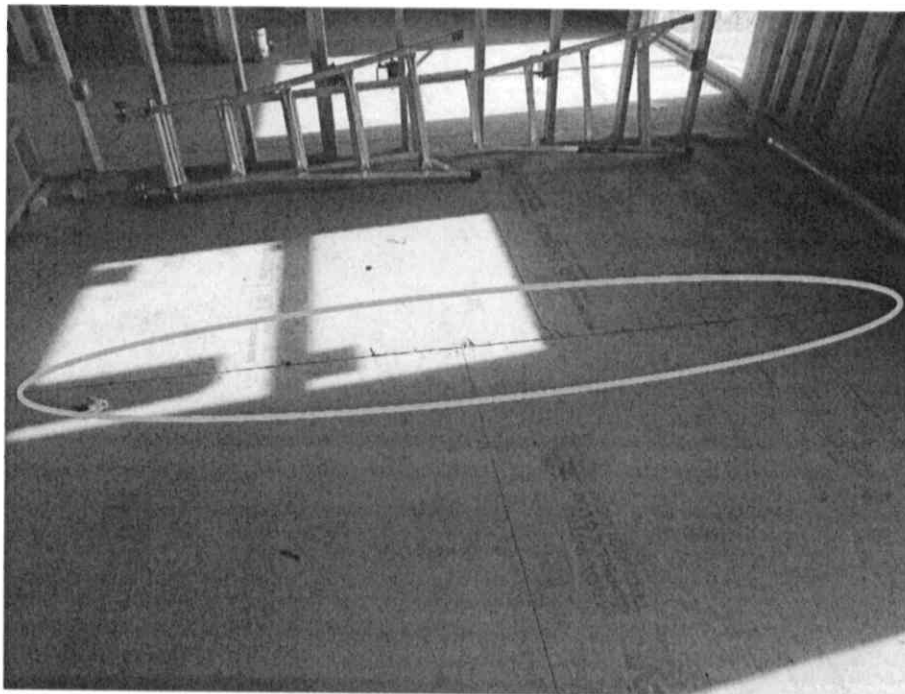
View of Living Room area with OSB spalls. Note the aligned butt joint location of several adjacent panels (blue oval).
